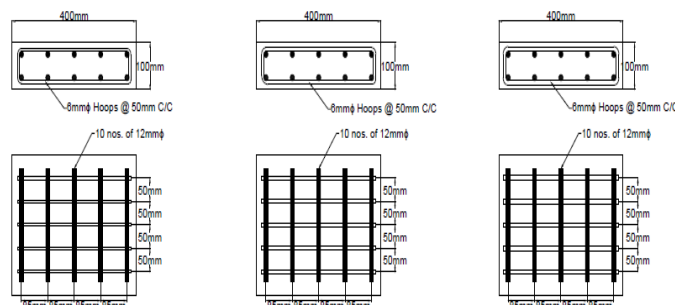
Typical view of reinforcement details for A4 & B4 & C4 specimens
